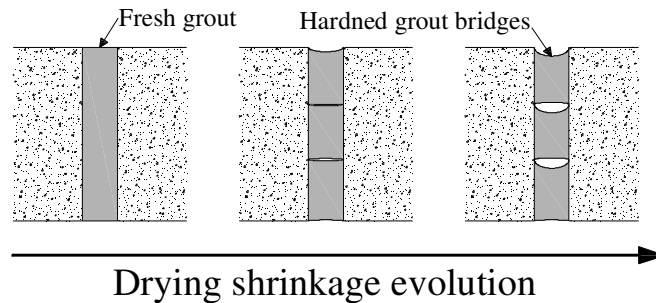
Drying shrinkage evolution of a mud grout used to repair a crack.
